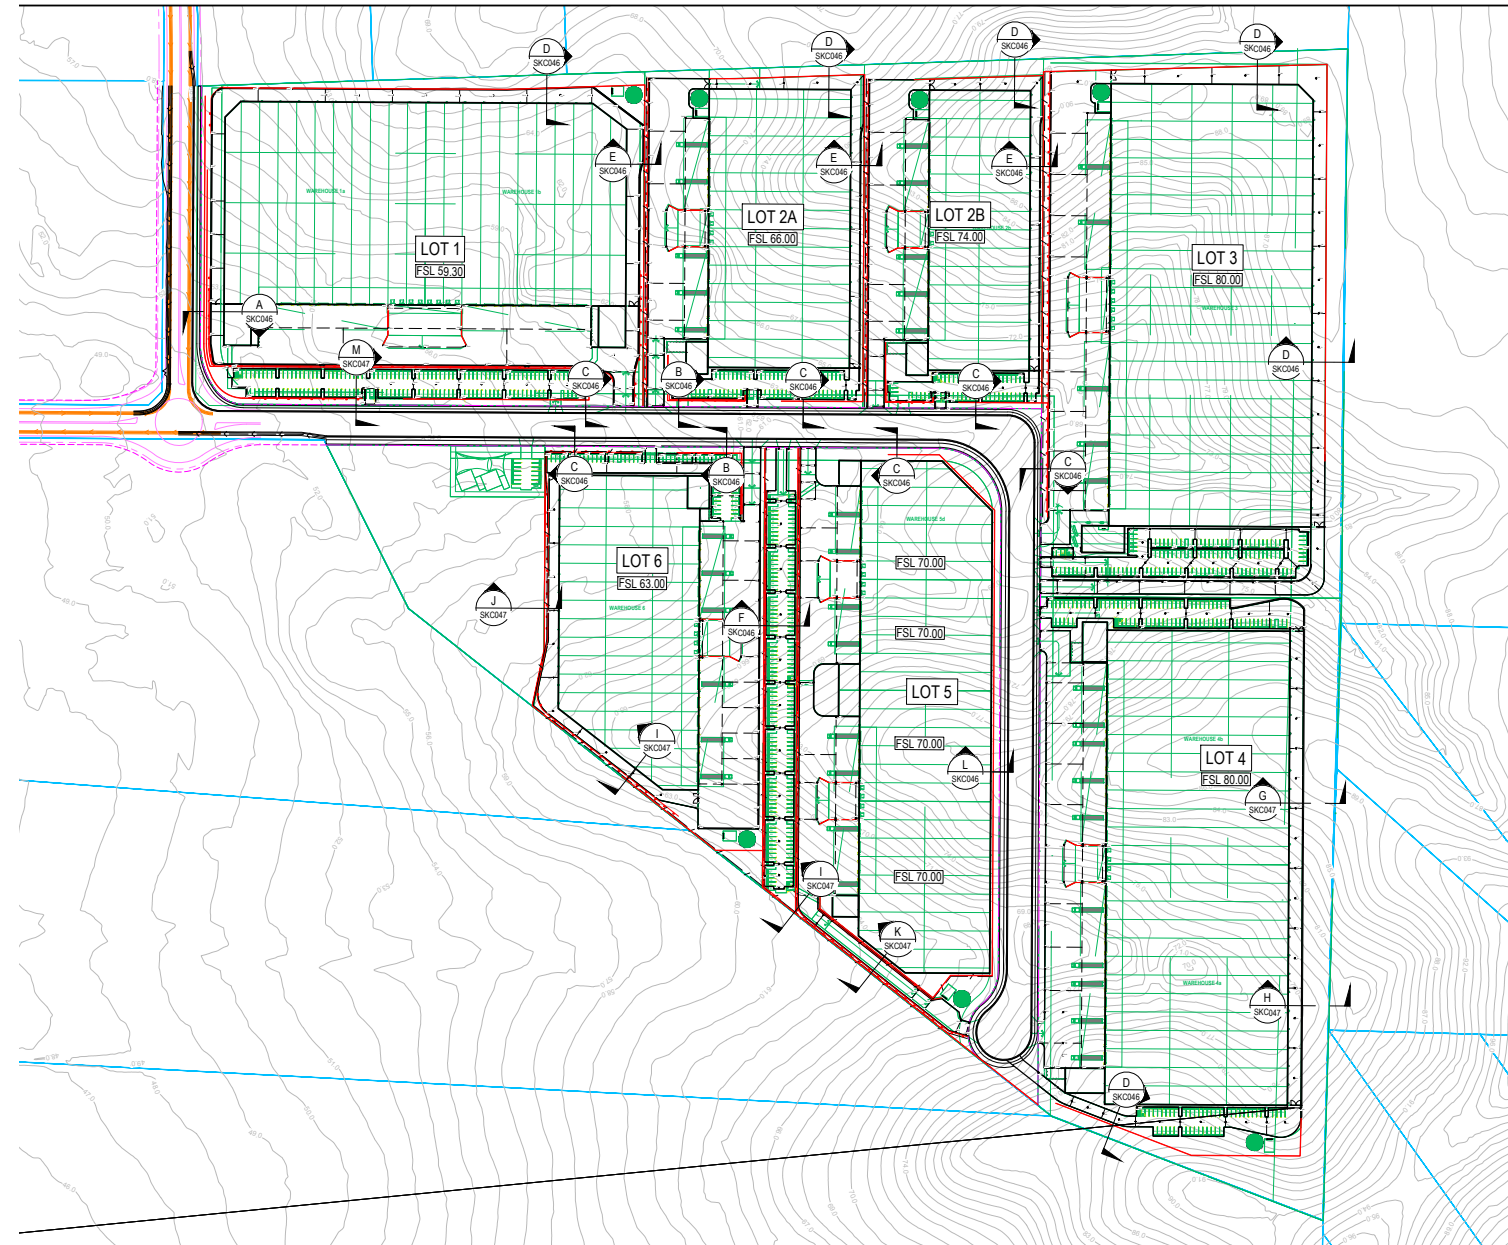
General Arrangement Plan 1:5,000 [sourced from AT&L Engineers]
